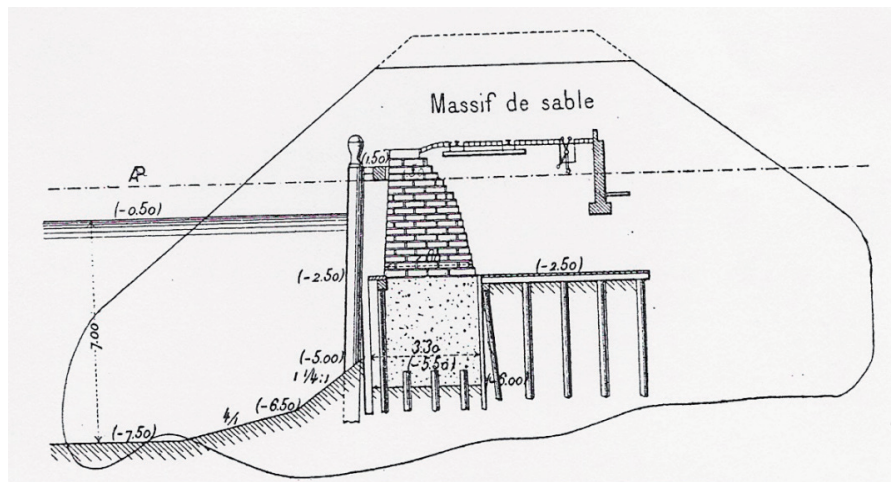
Quay wall structure in Amsterdam with preloaded site [Rochemont, Desprez 1900]
